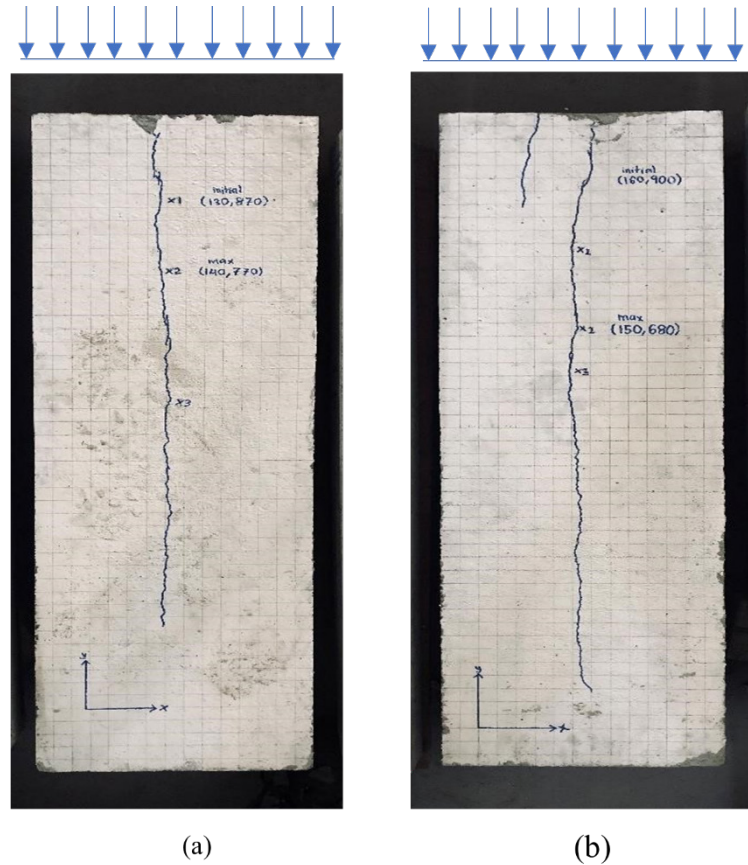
Crack Pattern of the samples (a) wall panel containing perlite and RCA, (b) control wall panel
